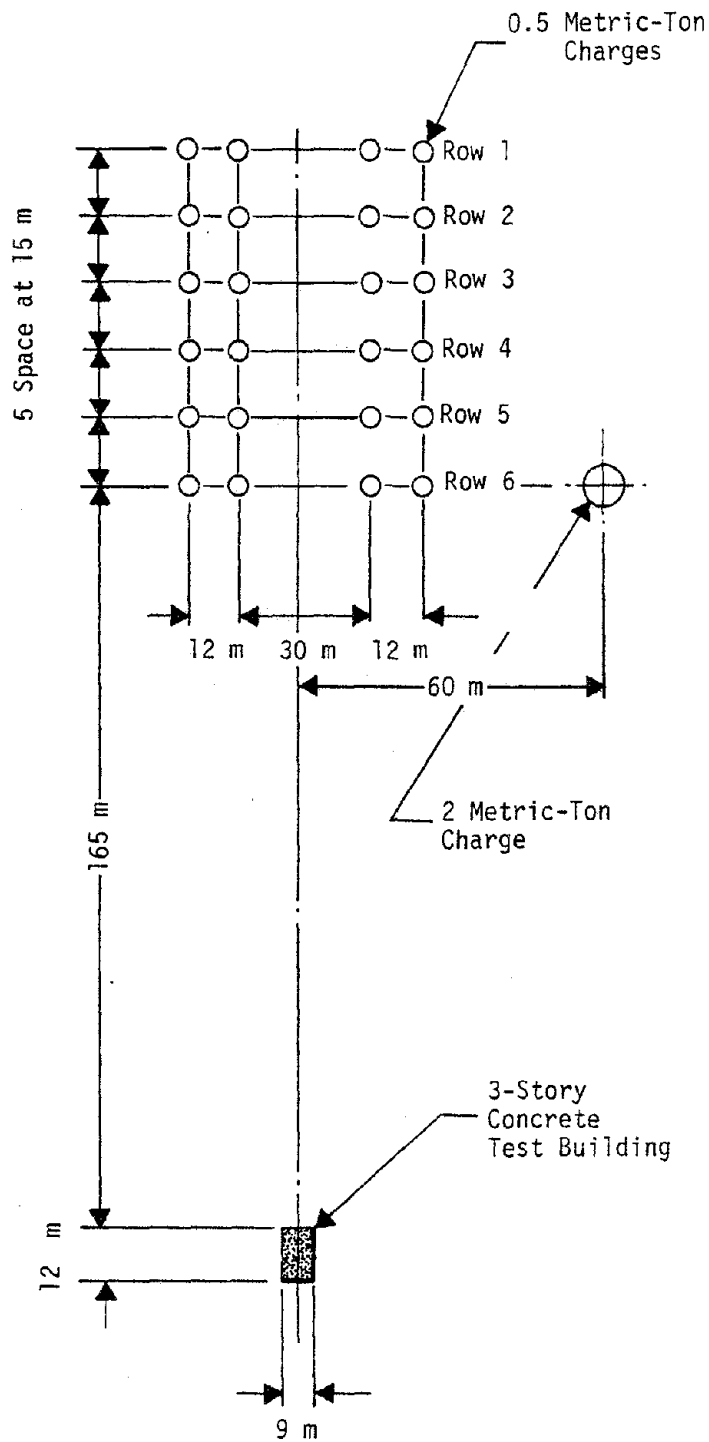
Layout for Soviet Tests of a 3-Story Concrete Test Building (ref. II-18)
